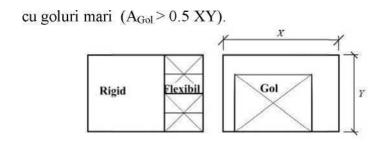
Floors with insignificant stiffness in plan (examples of composition)
